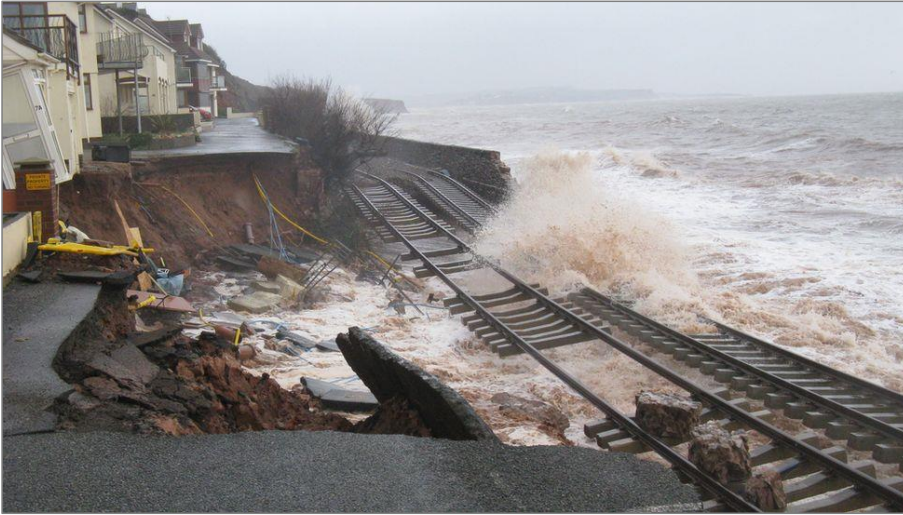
Storm damage to the main railway line to the south-west peninsula in 2014.
